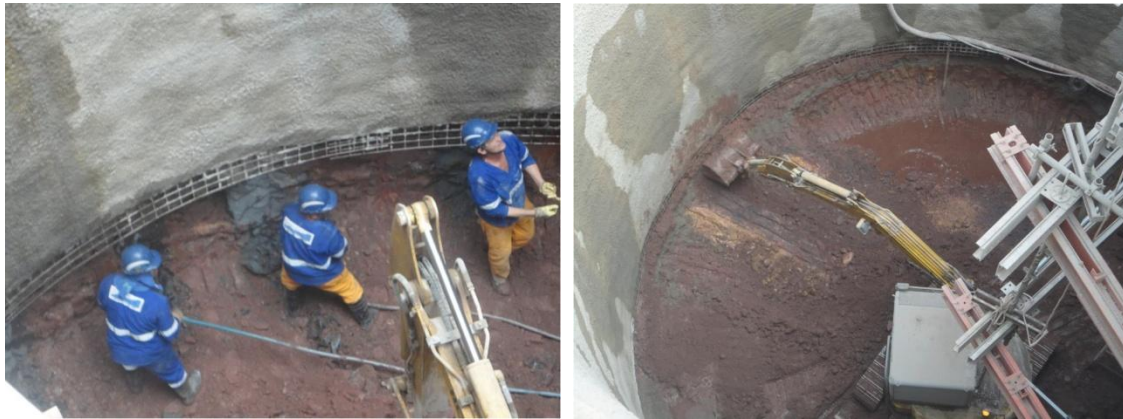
Detail of Shaft 1 showing (a) installation of the steel mesh reinforcement, where the discontinuity of the jet grouting columns can be observed, and (b) excavation in cohesive silty soil. (Source: ATO GeoCompany).
